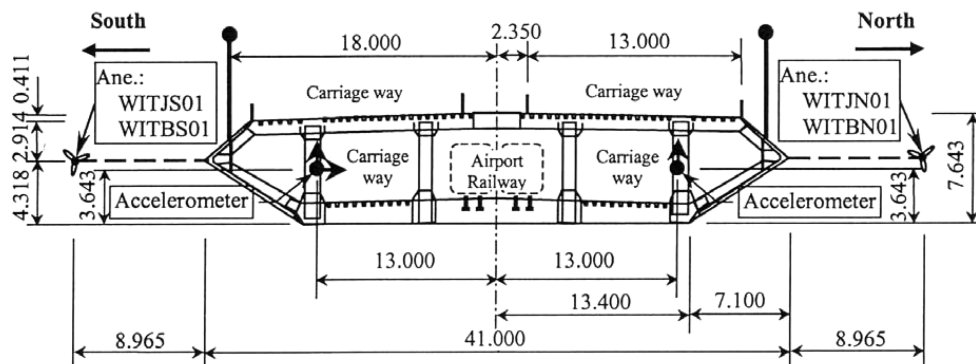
Cross-section of bridge deck and sensor locations (dimensions in metre)
